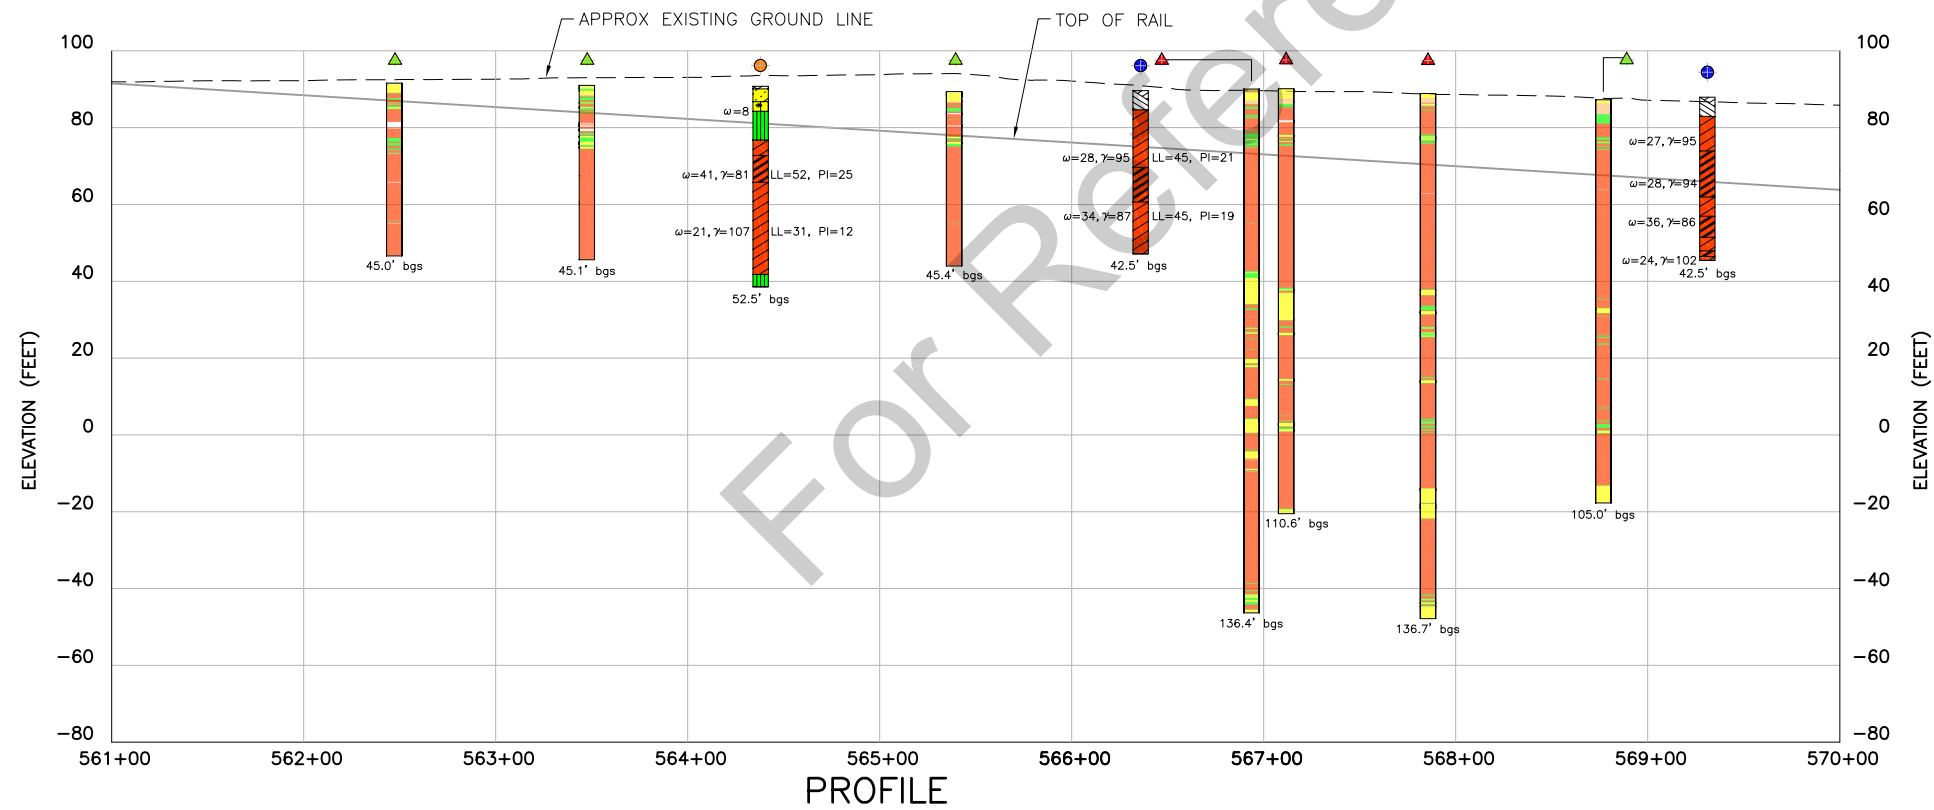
Geotechnical Plan and Profile with Classification Test
